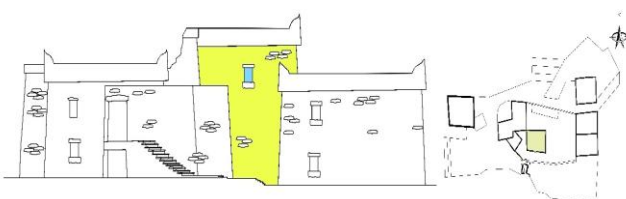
Floor plan and south facade of Bin Rogosh Historical Palace building. Source: The author
